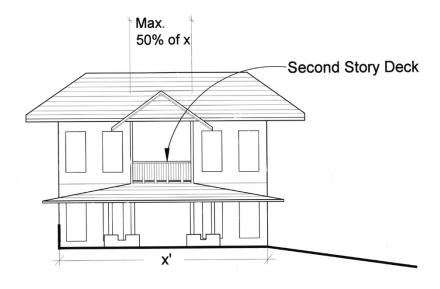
Second Story Deck Elevation – NOT ALLOWED
